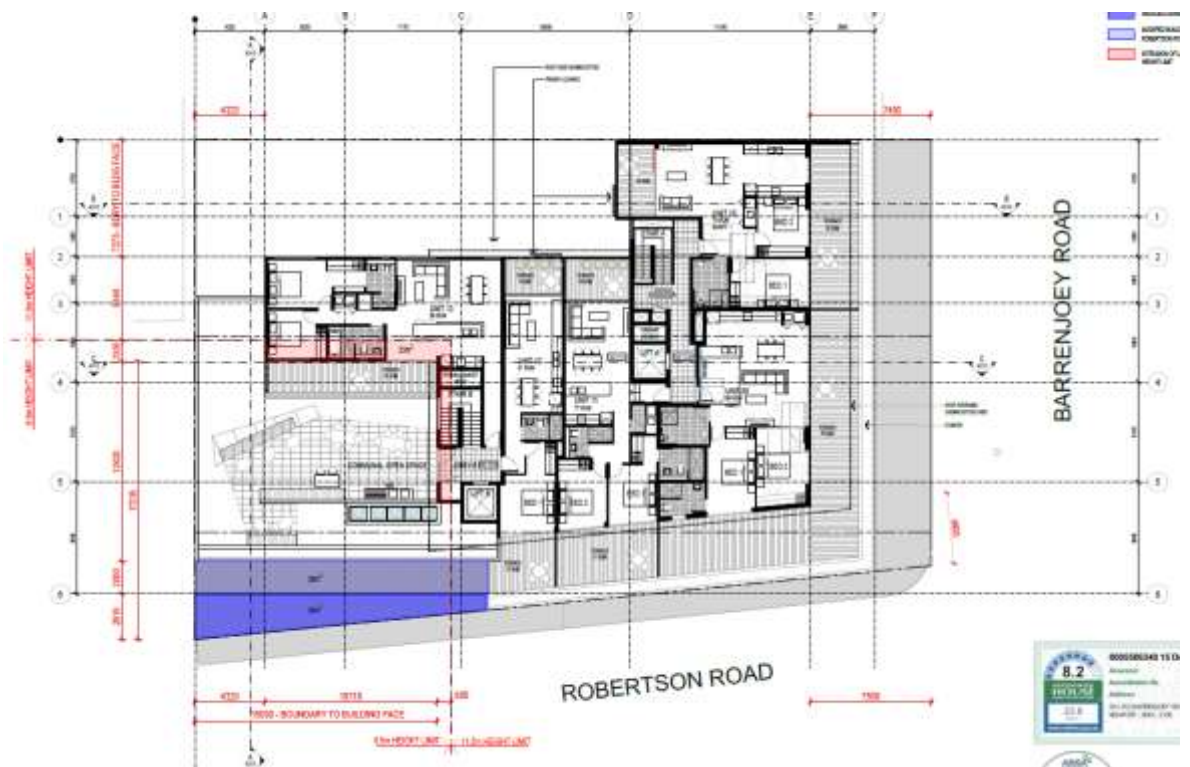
Original development application, second floor layout, with extended built form towards the south-western corner of the site
